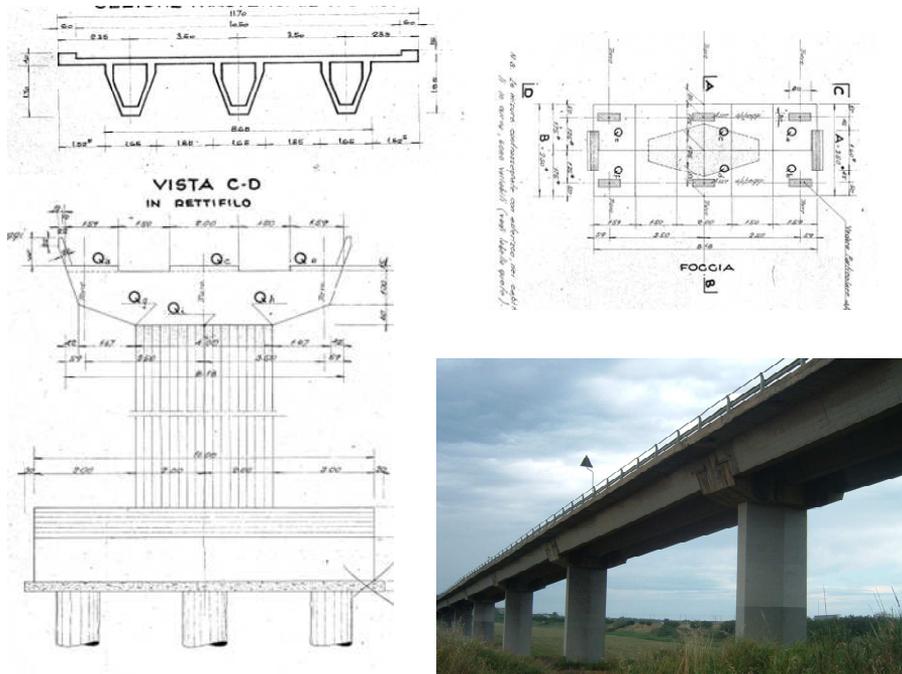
Example of simply supported viaduct with polygonal hollow or full piers and on piles foundations
